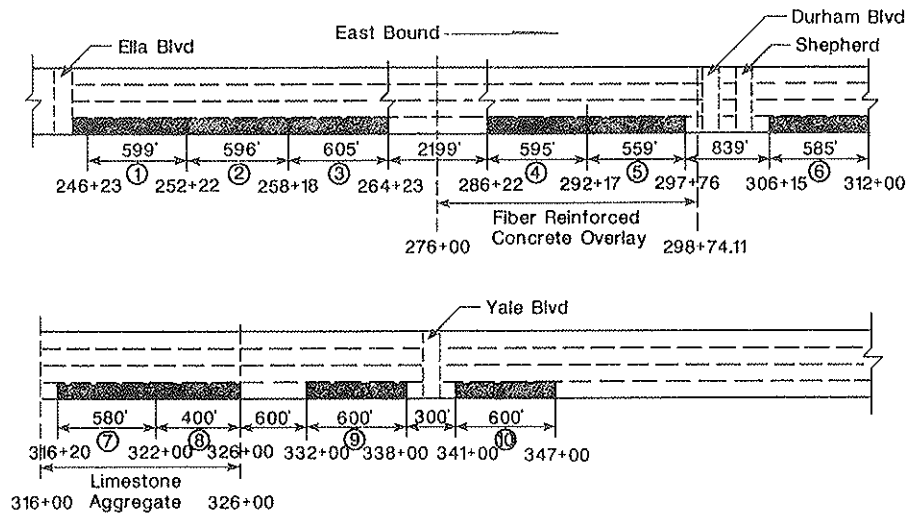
Plan view showing locations of the ten test sections, eastbound IH 610 North, Houston.
